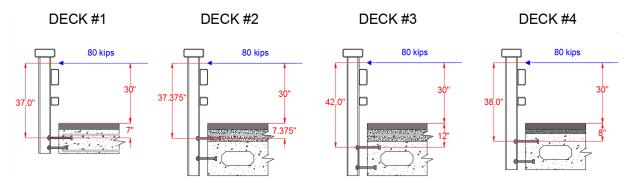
Moment Arm between SUT Design Impact Loading and Tension Anchor Rods
